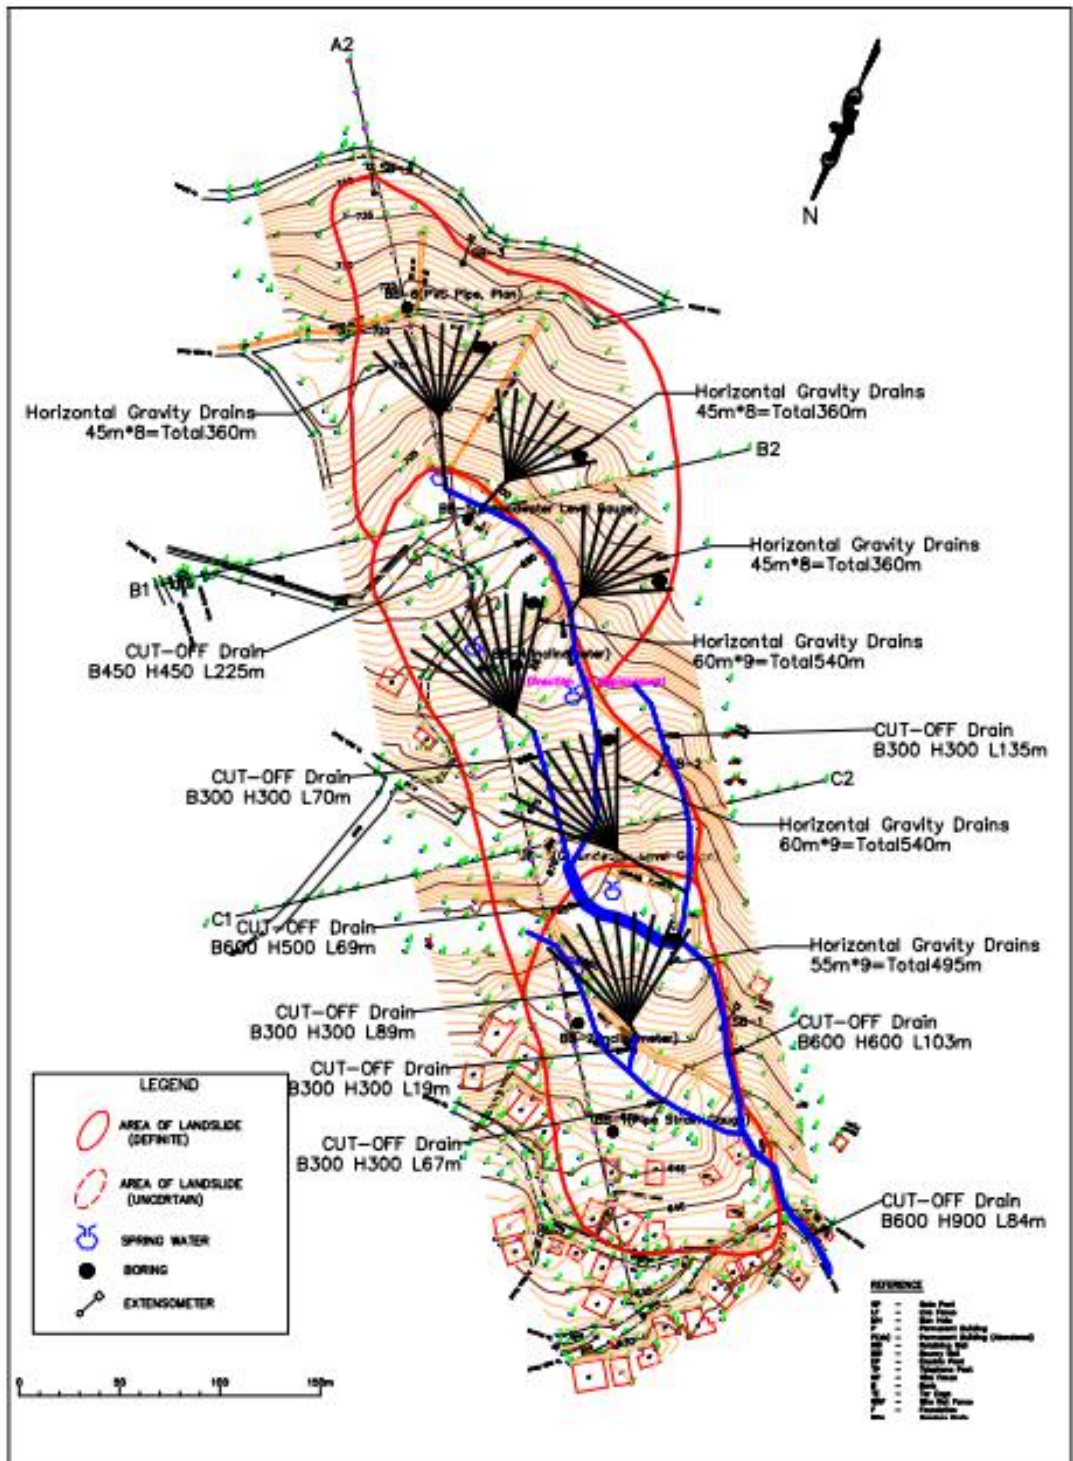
Plan View of the subsurface drainage improvement (JICA Report, September 2015)
